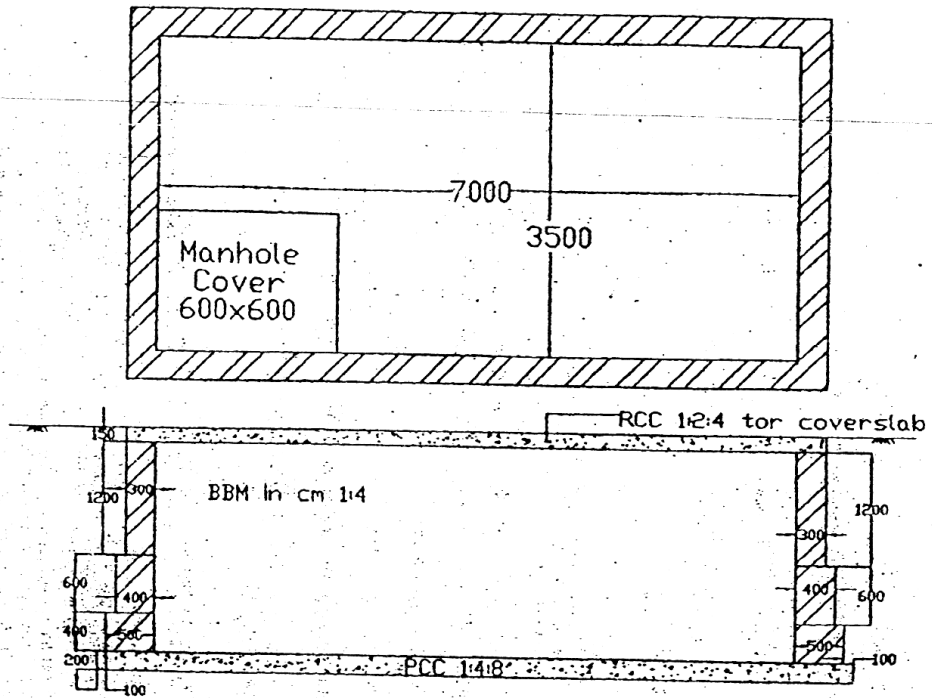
SKETCH OF SEPTIC TANK-PLAN AND SECTION
